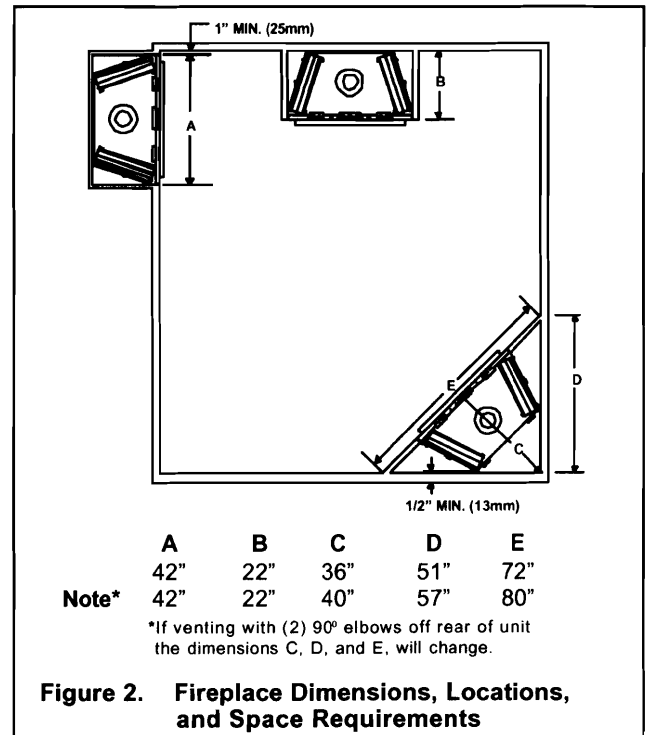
Fireplace Dimensions, Locations, and Space Requirements
